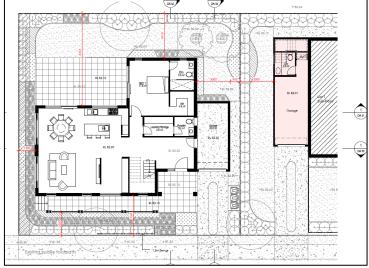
Proposed ground floor plan of new dwelling & lower ground floor plan of existing (heritage) dwelling
